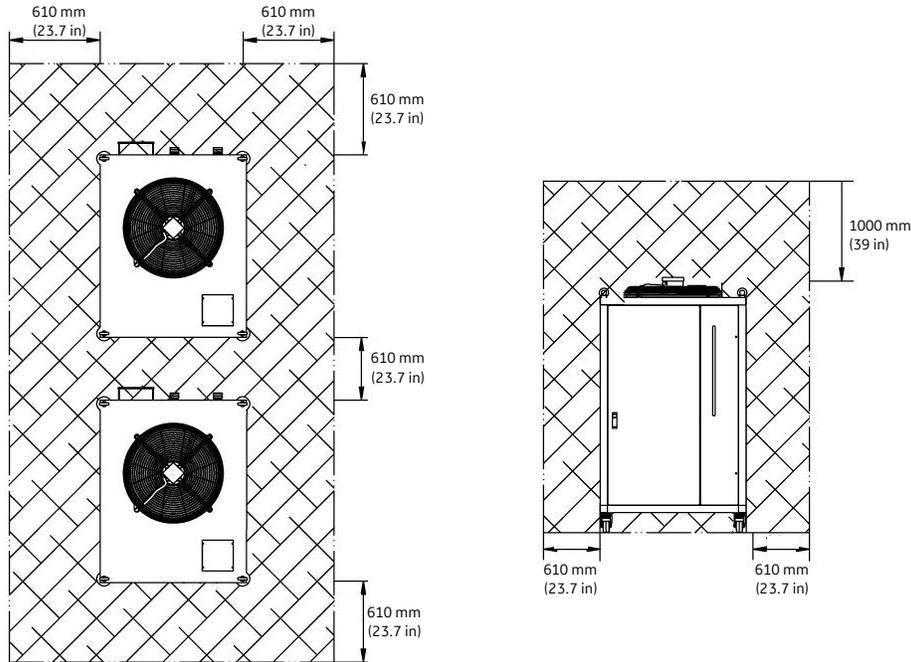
11kW Airsys Water Chiller Dimensions and Service Clearance for Single Unit
